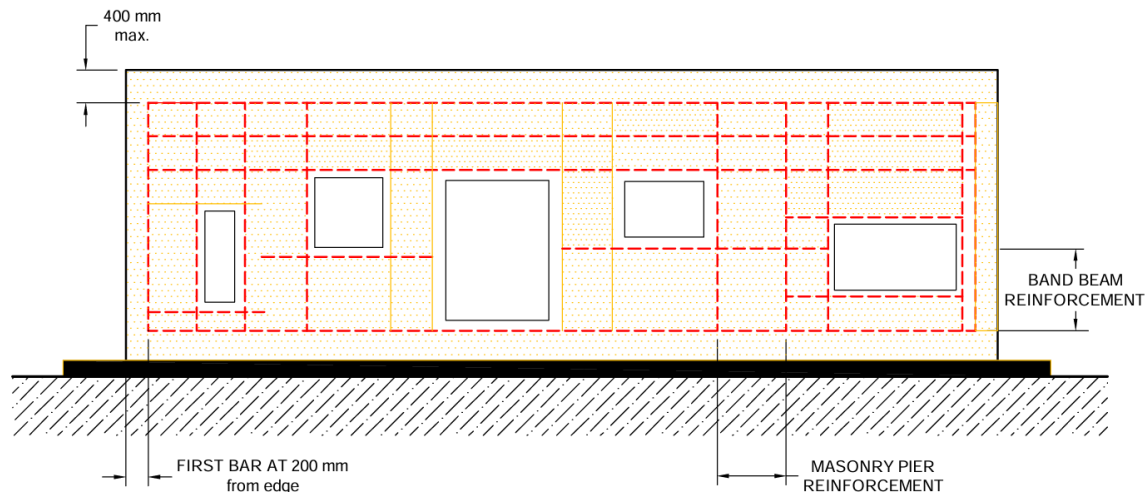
REQUIREMENTS OF MINIMUM REINFORCEMENT IN MASONRY WALLS (RMB 1)
